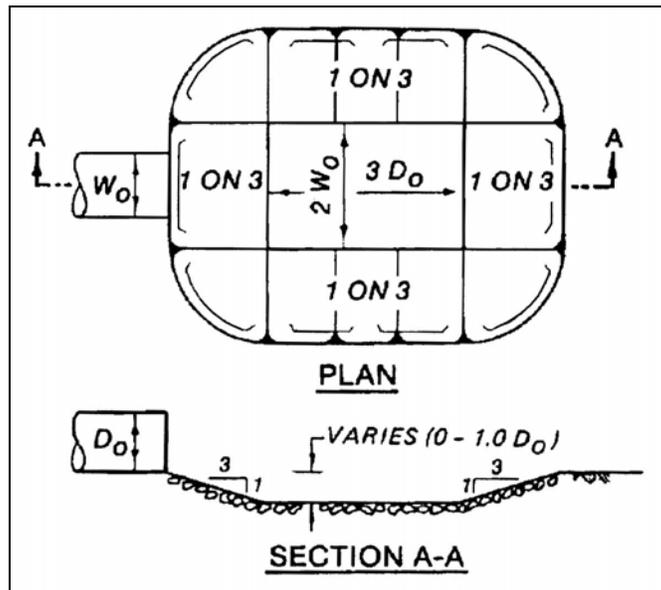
Culvert Outlet Erosion Protection, Lined Channel Expansion
